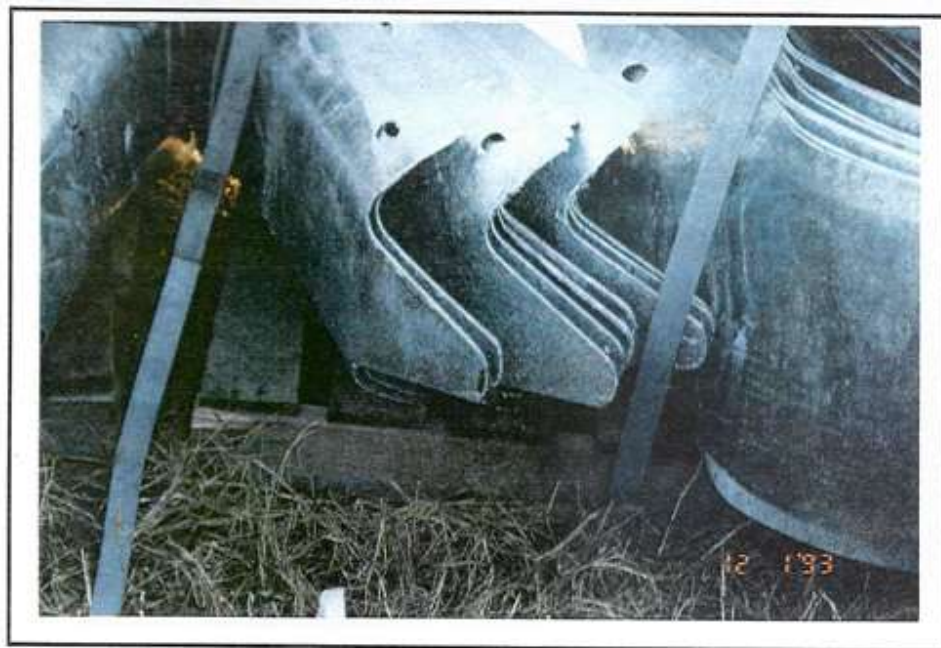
Condition:* Bare Spots (Exposed Steel)
